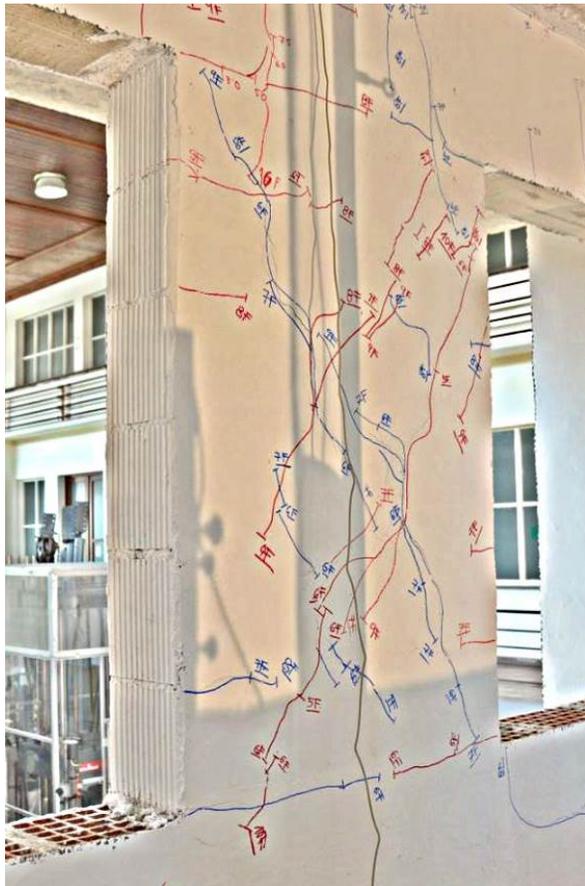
Crack propagation pattern of the middle pier on the ground floor at 0.39 % drift.
